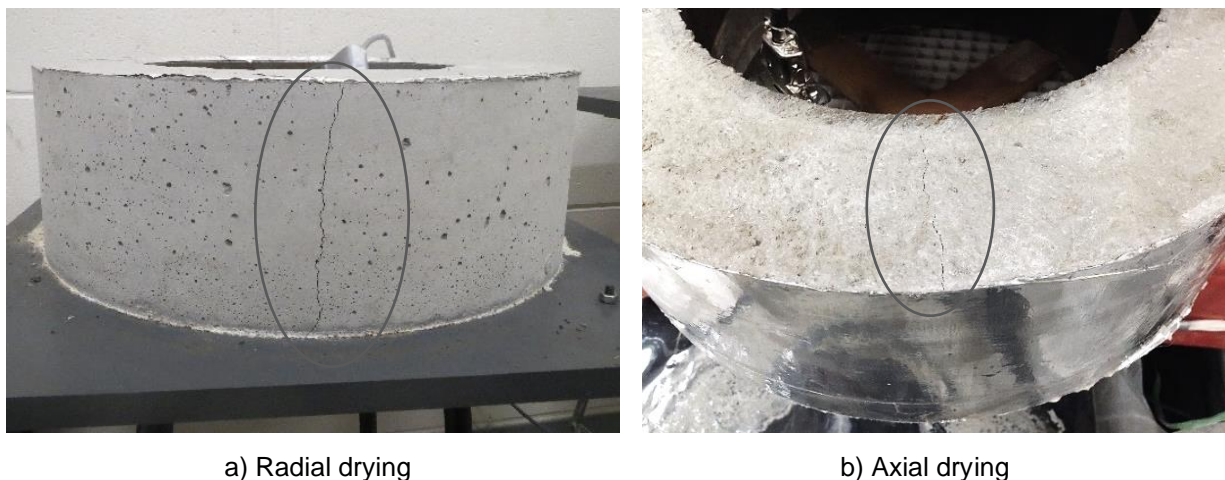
Cracking observed in restrained ring specimen (0.45 w/cm mixture)
